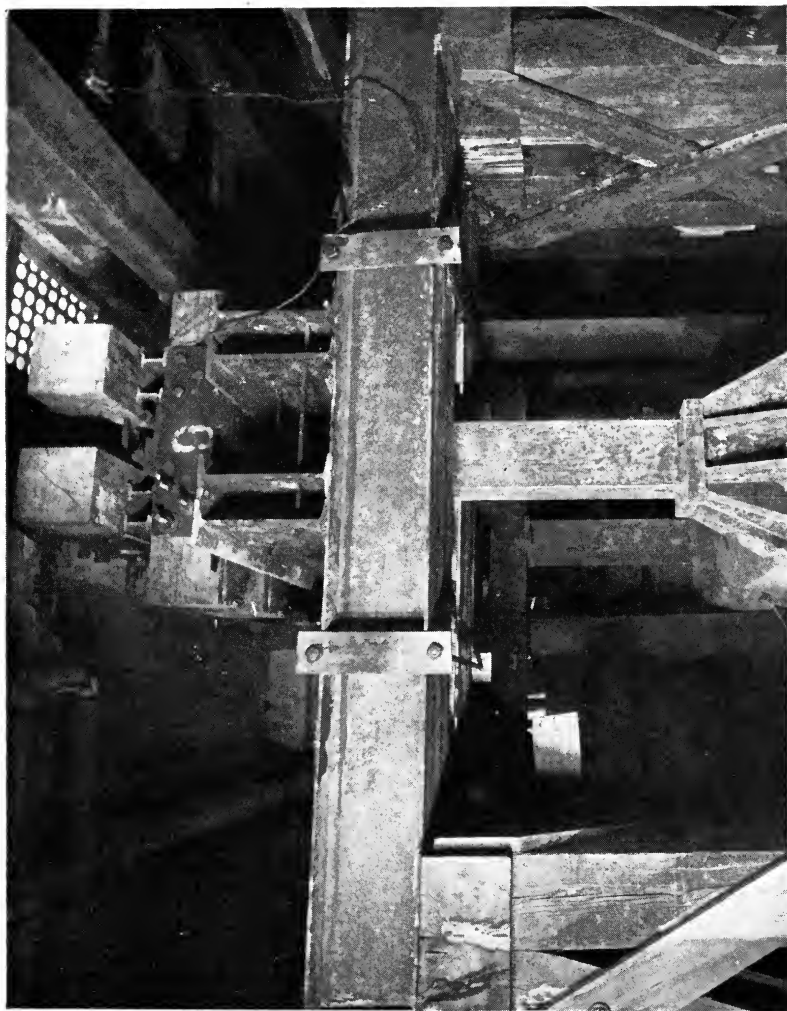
Method of Needling 250-Ton Cast-Iron Columns. Detail of column clamp shown on Plate No. 8. Note timber towers, with oak caps, and composite needle-beams as shown on Plate No. 11
